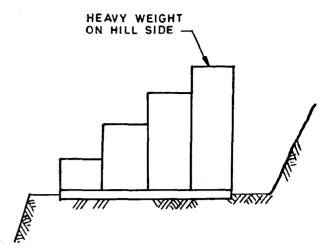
RAFT FOUNDATION ADJACENT TO HILL SLOPES
